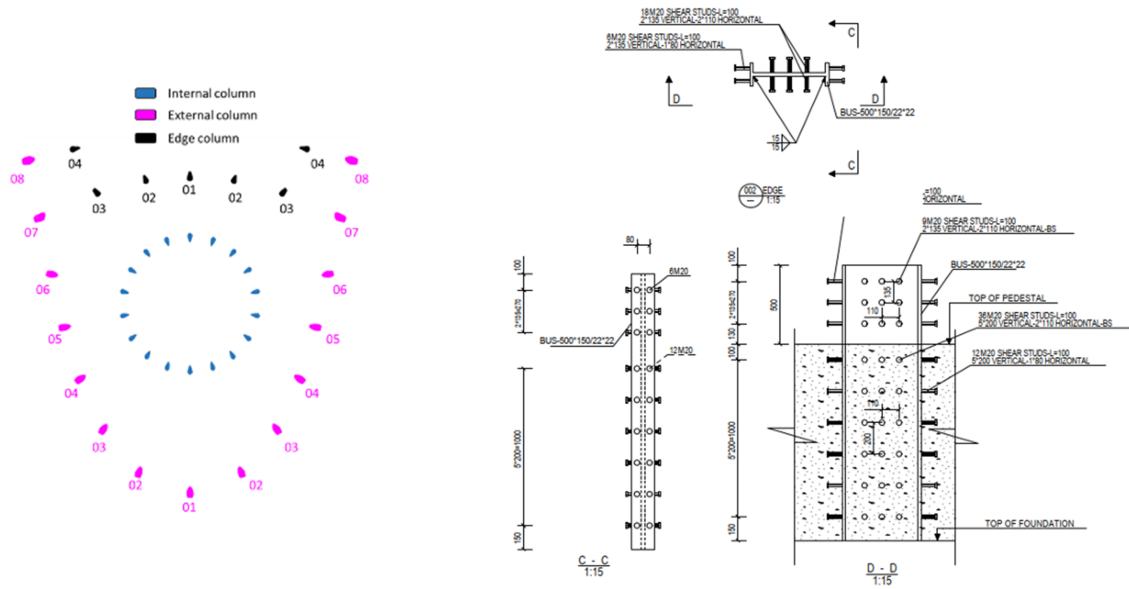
Column layout (left), column reinforcement intent – section of edge column 2
